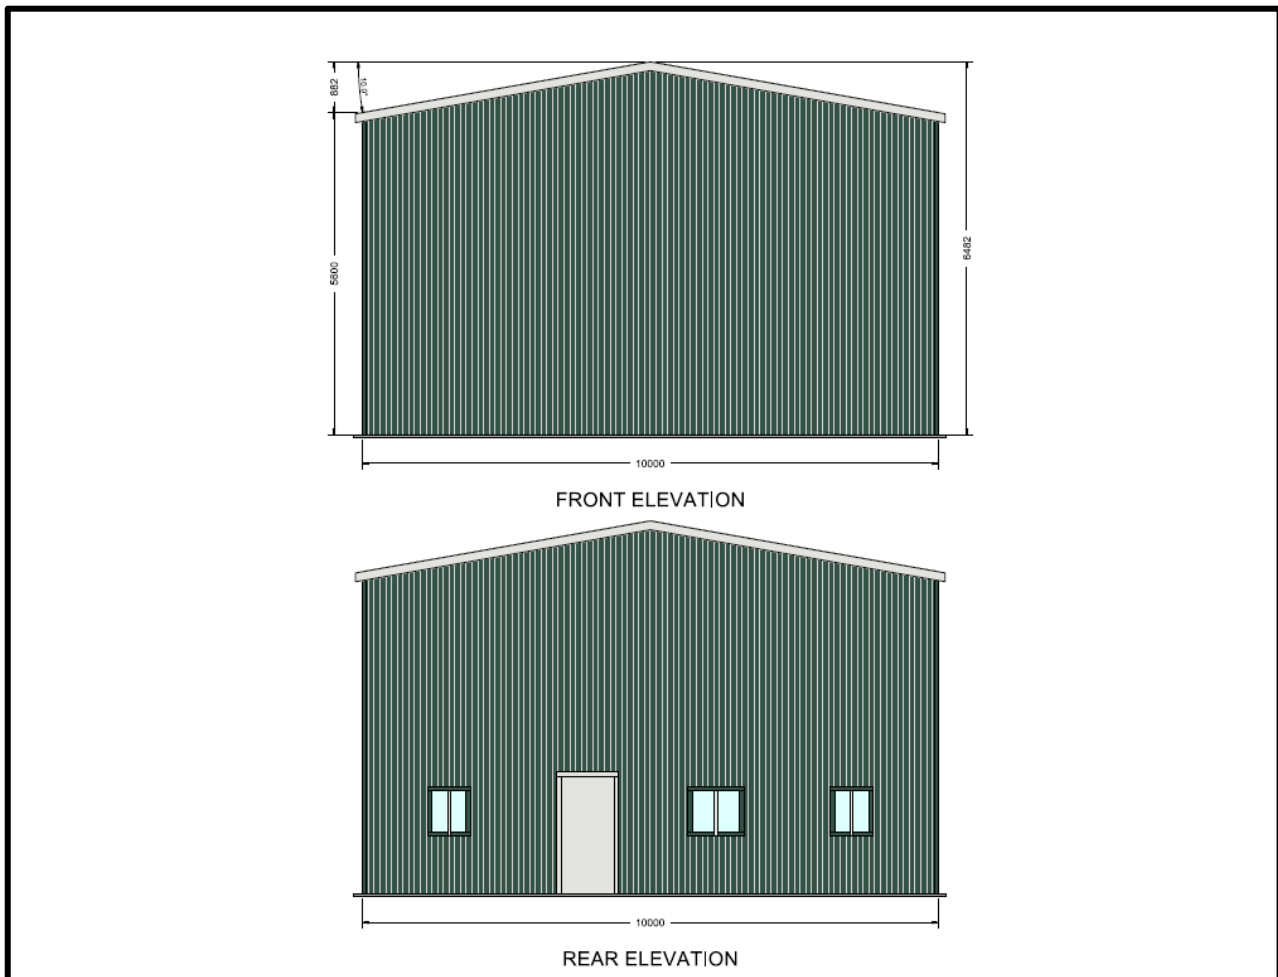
Elevations of Shed and Office (Source: Tumut River Sheds)
